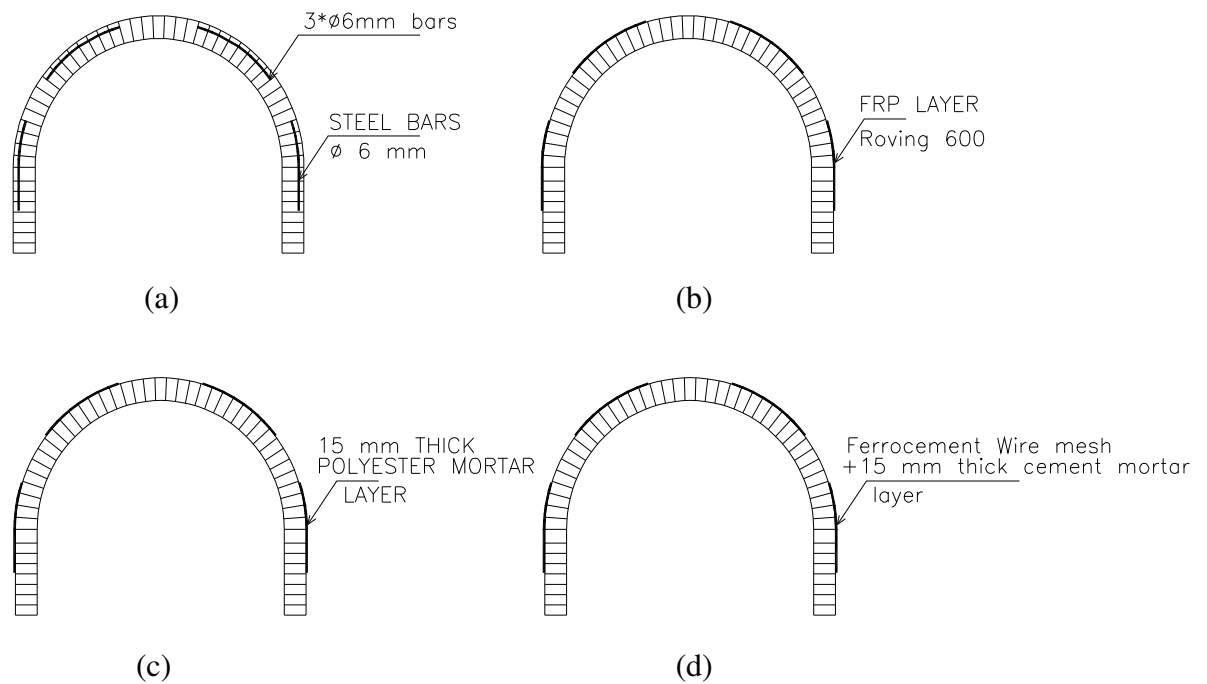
Strengthening techniques for vaults, a) steel reinforcement, b) FRP sheets, c) Polyester mortar external layer, d) Ferrocement.
